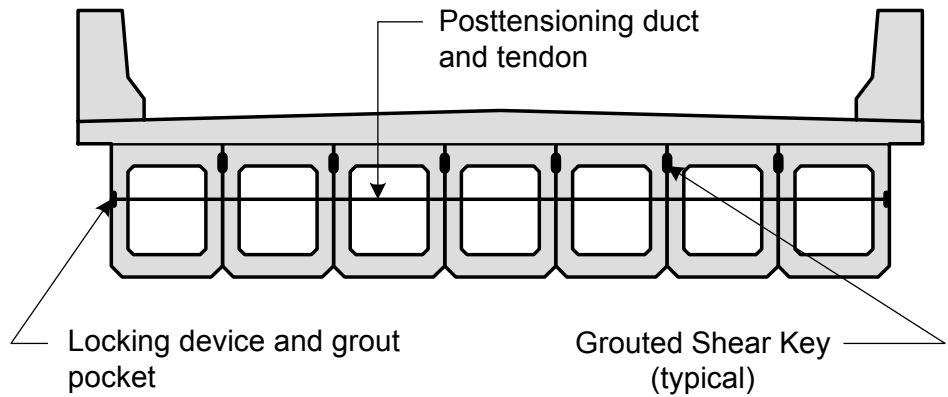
Schematic of Lateral Post-tensioning of an Adjacent Box Beam Bridge
